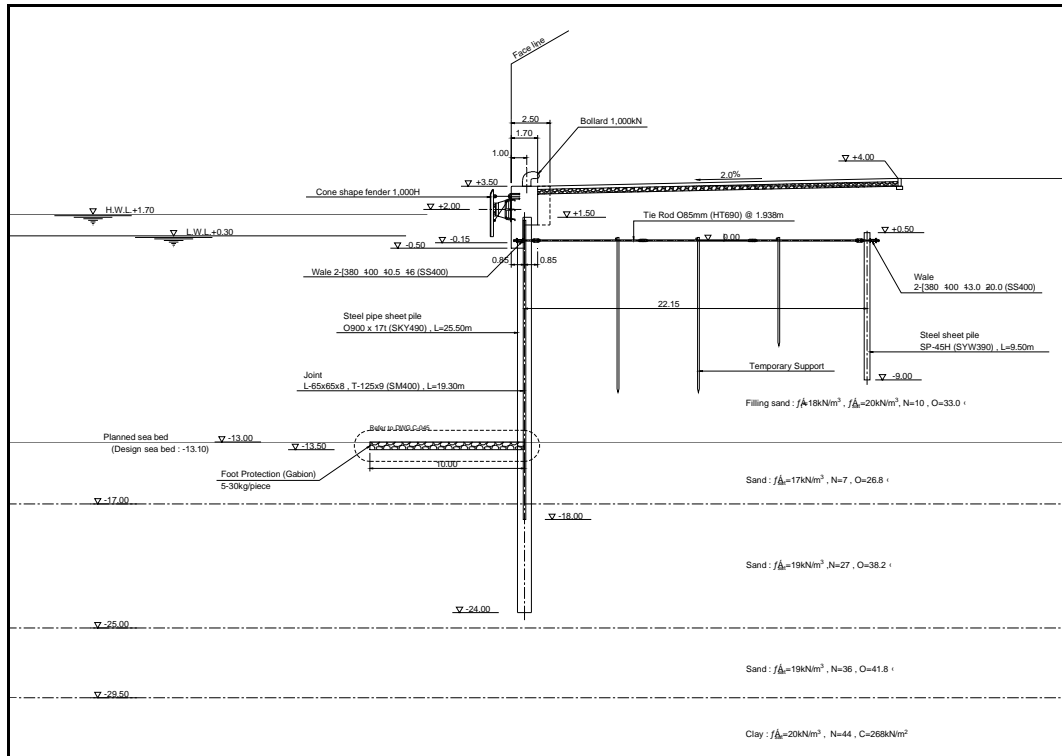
Typical Section of -13m NNQ
